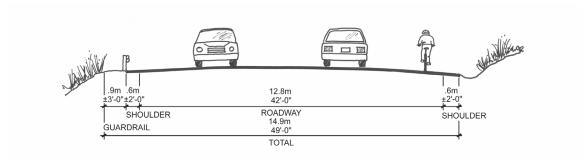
Existing Conditions at Lincoln Boulevard at Pershing Drive North
